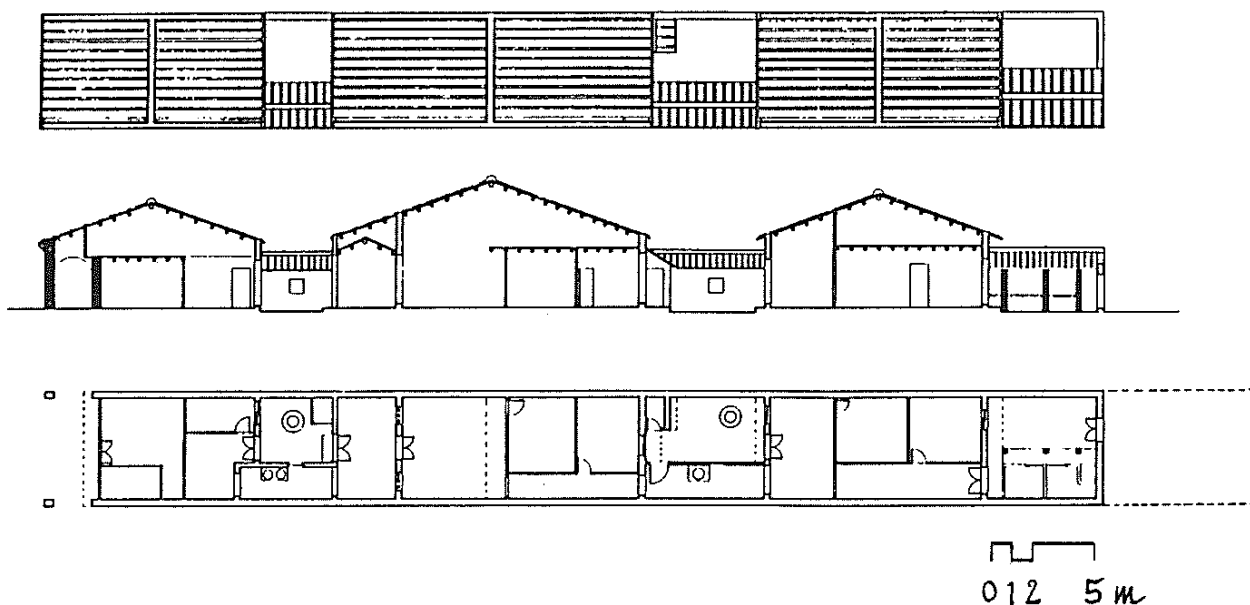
The original model of the Chinese shophouse in Thailand - the commercial-residential rowhouse typical of Fukien Province; This illustration shows a built example from Taiwan, where Fukien-type traditional Architecture can be found in many places
